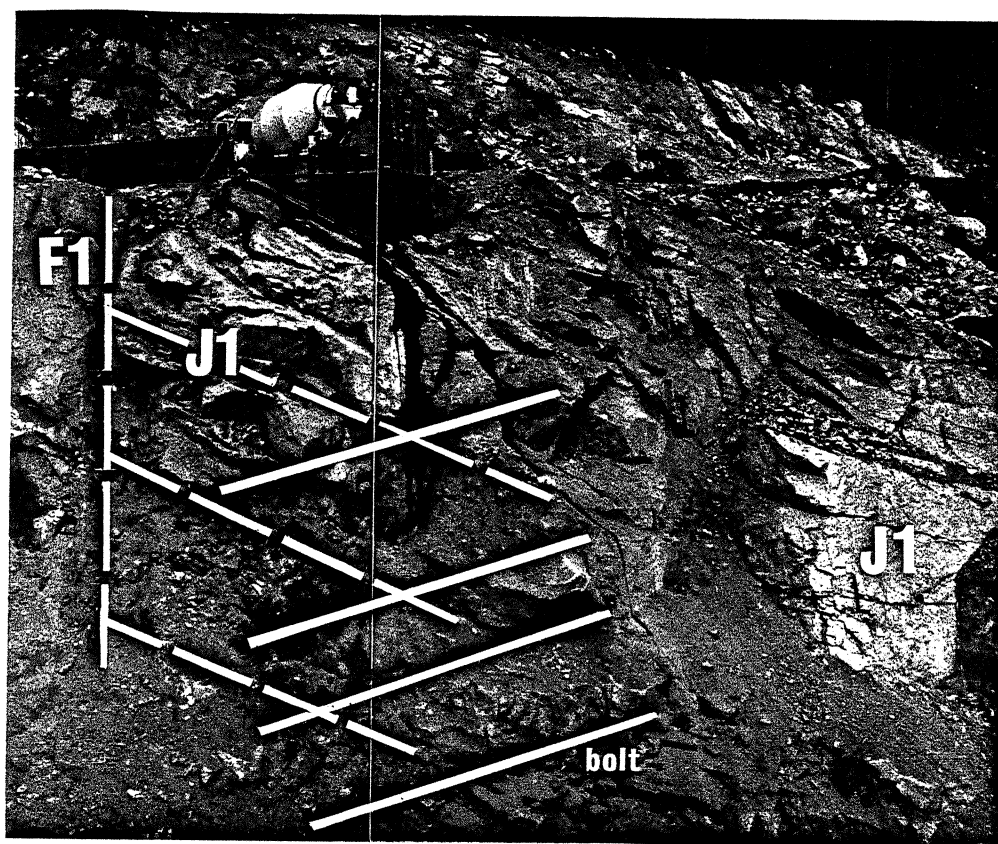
Ottomite Bridge south pier showing joint planes and rock bolt locations.
